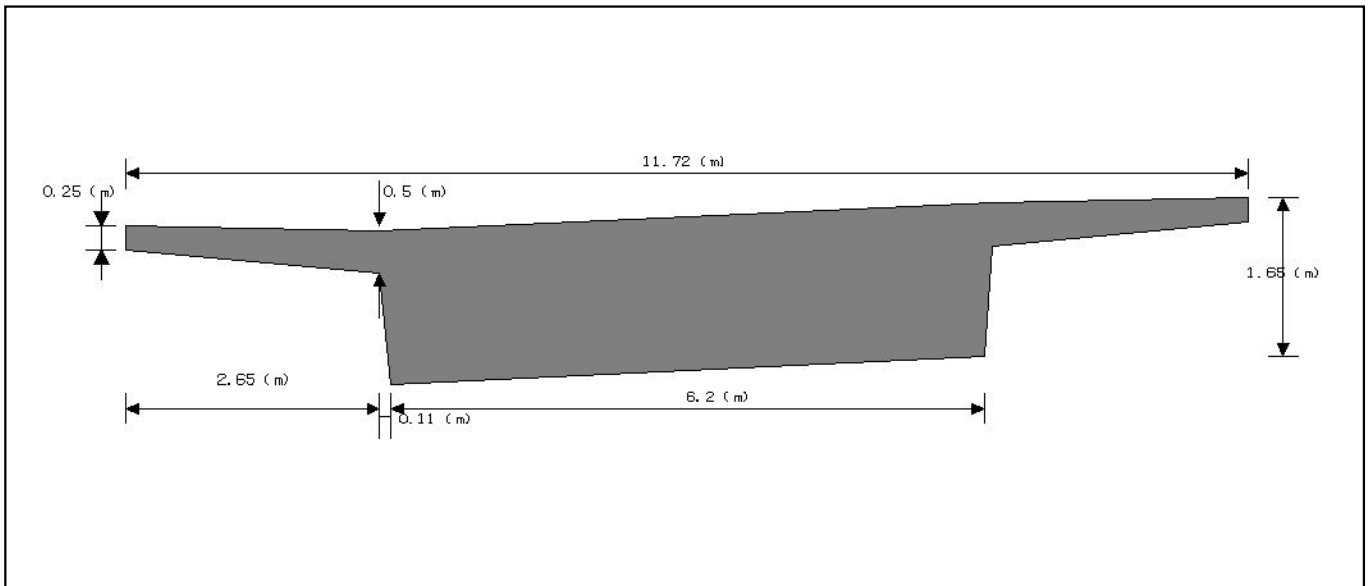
Down station view for Span01 cross section - Station 0.0 .
